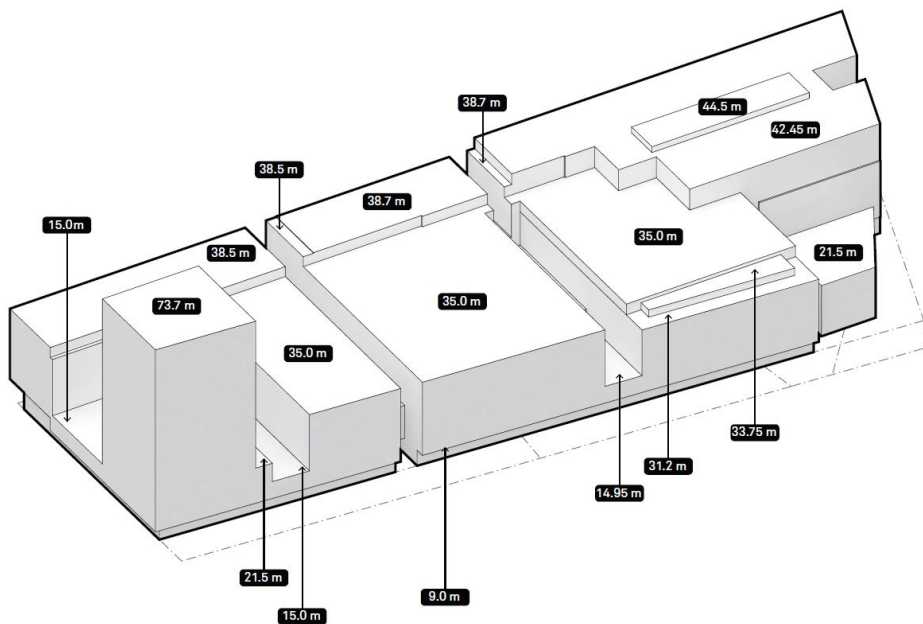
Central Barangaroo building envelope axonometric view. Source: Hassell 2020.
